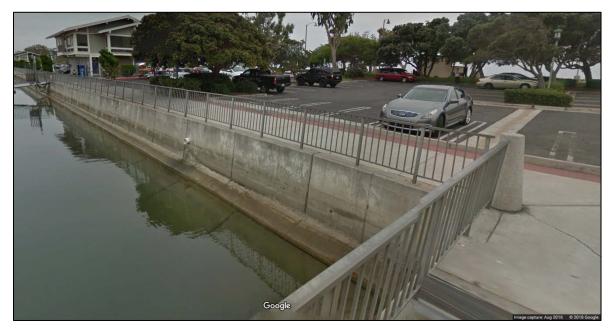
Typical Edge Condition for Dana Point Harbor Comprising a Concrete Bulkhead with Rail Fencing (Google Streetview, 2016)
